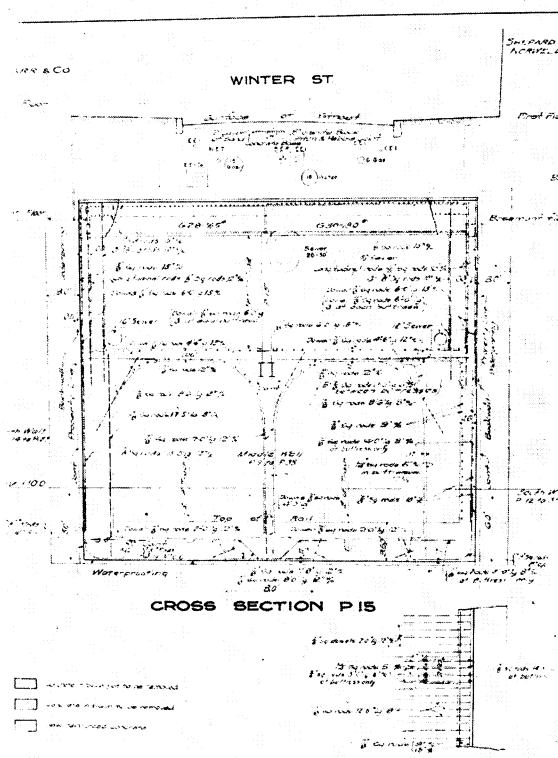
Typical Cross Section of Section A, Dorchester Tunnel
